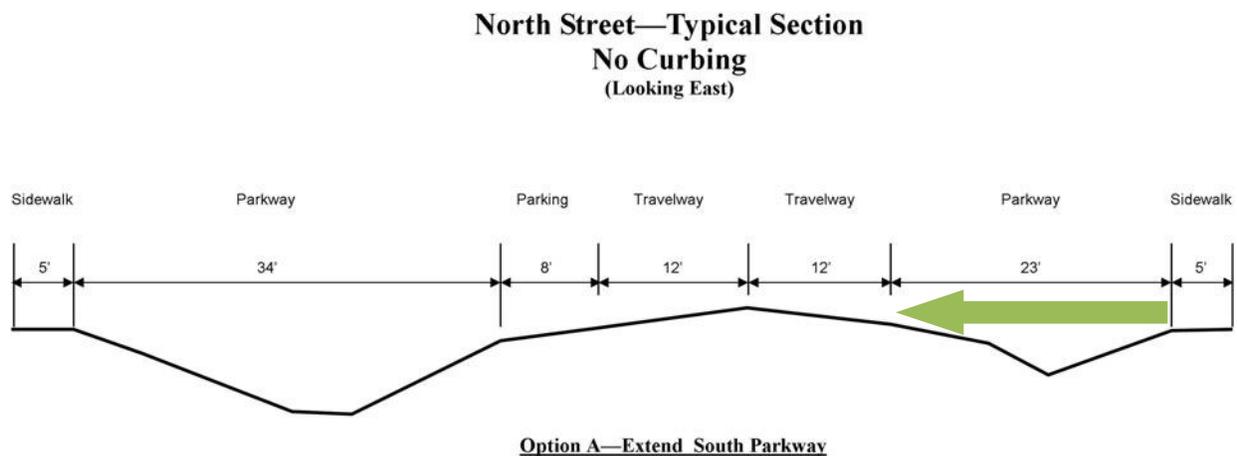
Option A – North Street No Reconstruction Cross Section (Source: Stuart I. Brown Associates, LaBella Associates)
